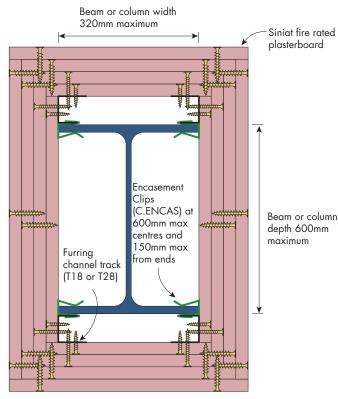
4 Sided Protection for I-Beam/Column Plan or Section
